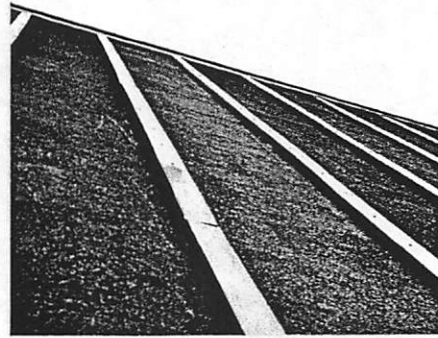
Example of leveled wall surface on Gateway Building in UK.
